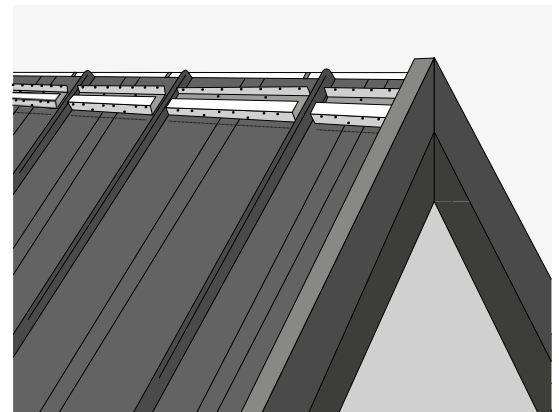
ROOF RIDGE: RIDGE FLASHINGS FOR THE UPRIGHT SEAM PANELS
